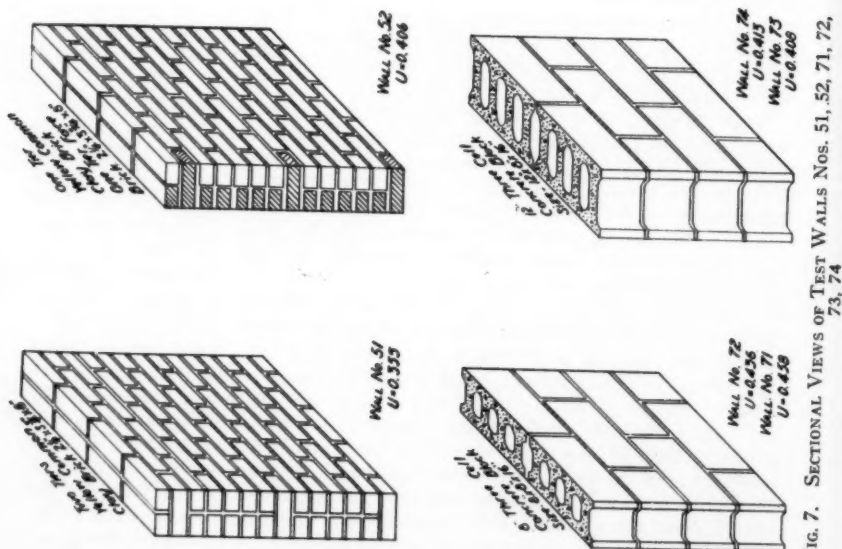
SECTIONAL VIEWS OF TEST WALLS NOS. 51, 52, 71, 72, 73, 74.
